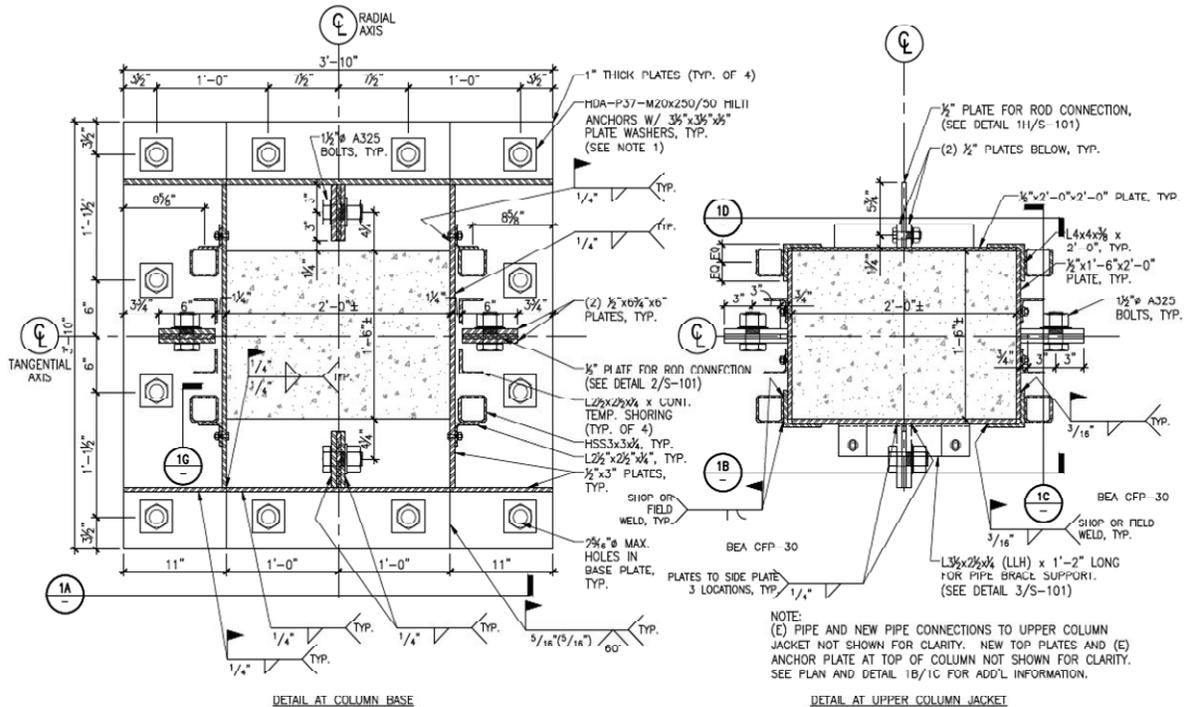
Upgrade Design – Concrete Columns and Anchorage, Plan View at Base (Left) and Mid-Height of Column (Right)
